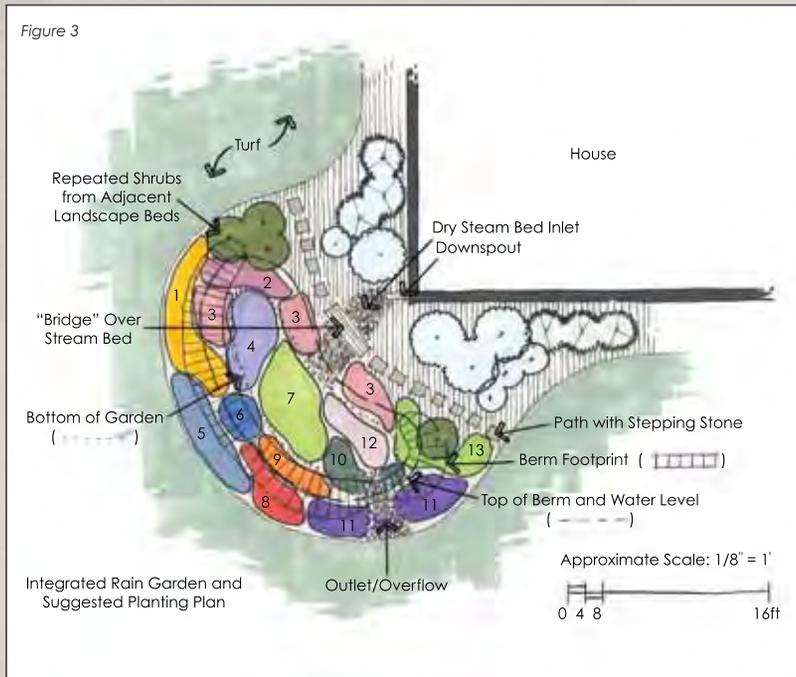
shows how a landscape near a house can be integrated with a proposed rain garden design. A garden that borrows or shares plants from existing or proposed landscape beds in the yard, or is physically joined with existing or proposed landscape beds, has a much stronger visual connection to the surrounding landscape. Access and maintenance can also be enhanced with beds that are linked together.
